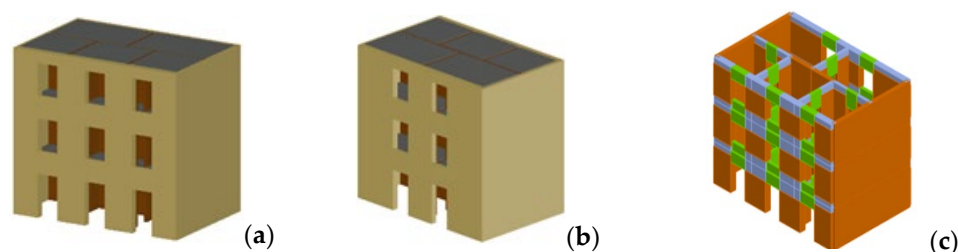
Building modelled with 3D CAD: (a) main façade; (b) back façade. Building modelled in 3Muri with spandrels, rigid nodes, and piers (c) Main Façade.
